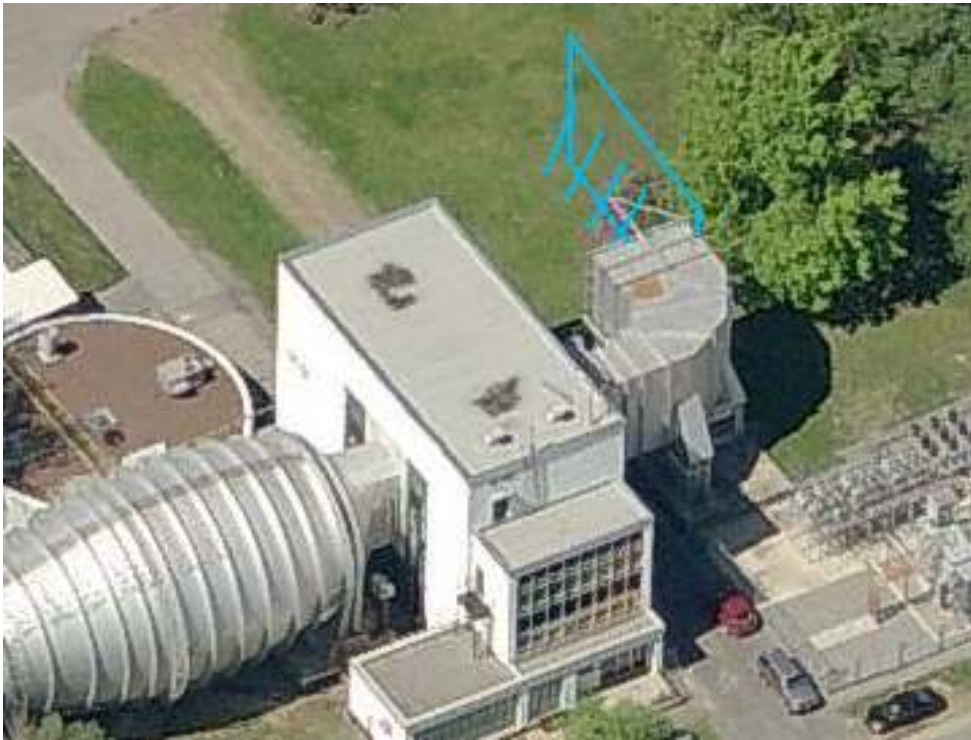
M46 Wind Tunnel Exhaust Barrier Wall – Concept View 3.
